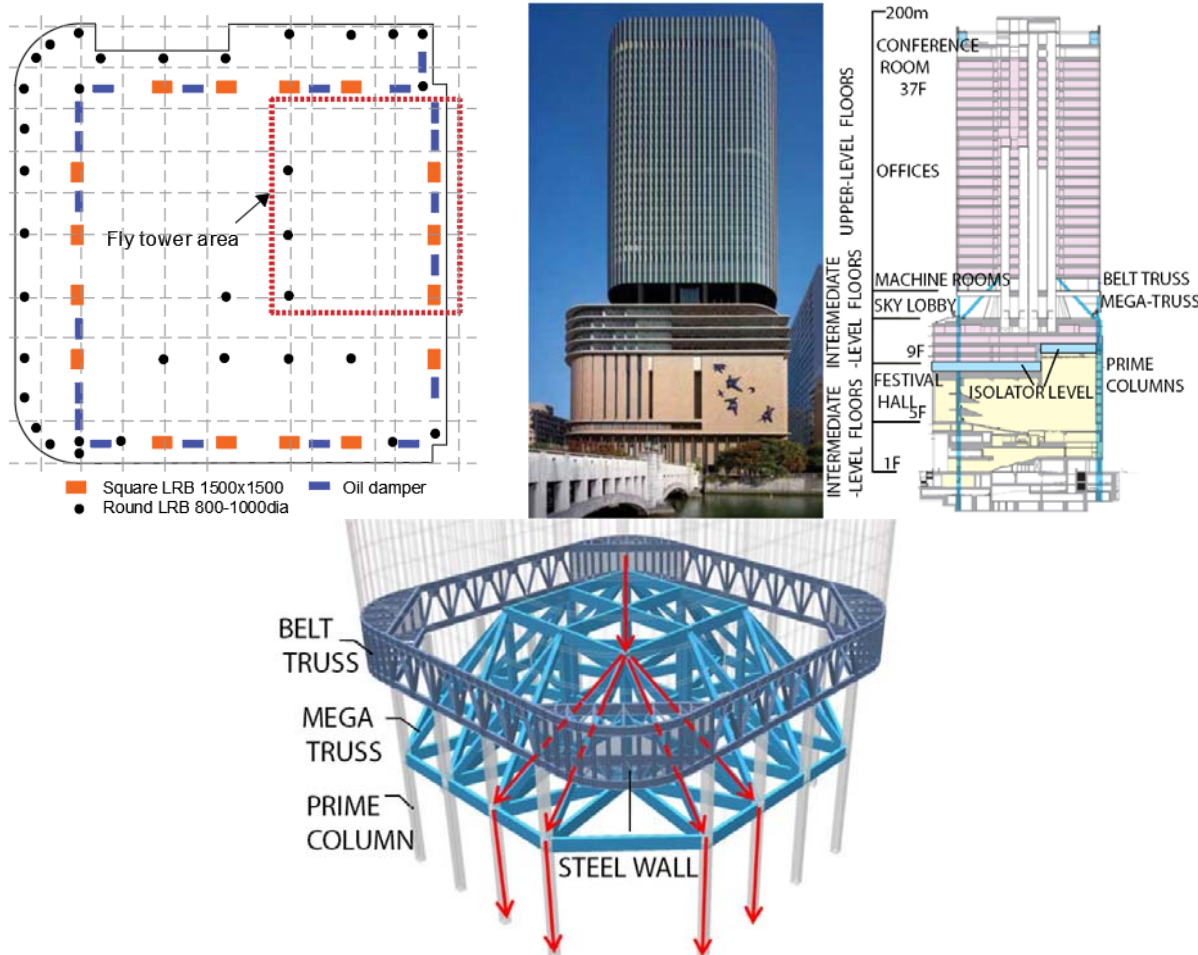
Nakanoshima Festival Tower Building plan, section, photo and detailed model [7], [9]
